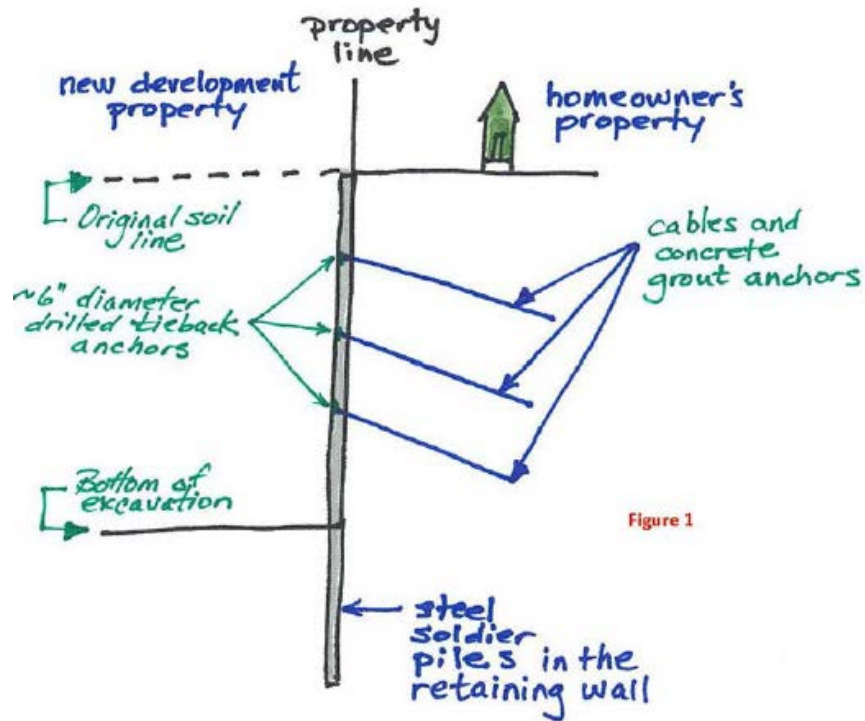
Schematic cross section of soldier beam and tieback shoring system
